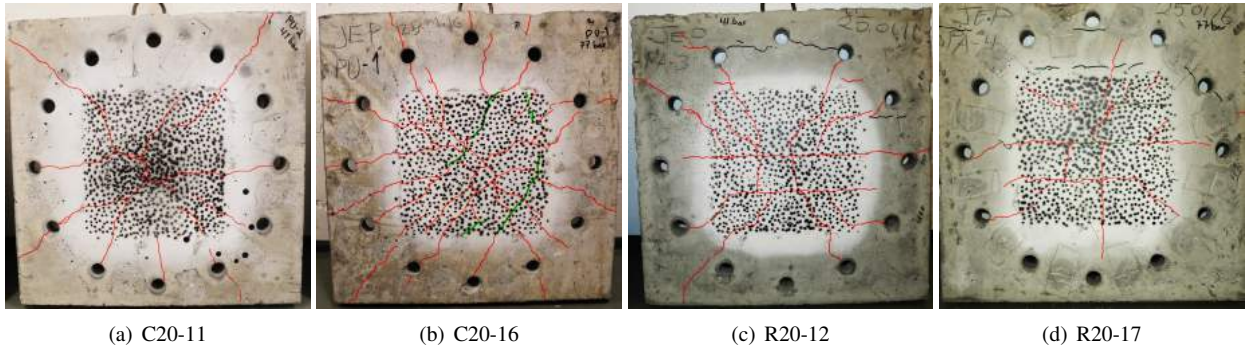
The four C20/25 concrete slabs tested in the shock tube. The side shown is opposite to the side where the shock wave arrives. Pre-existing cracks are highlighted with green, while cracks arising from the shock tube tests are red.
